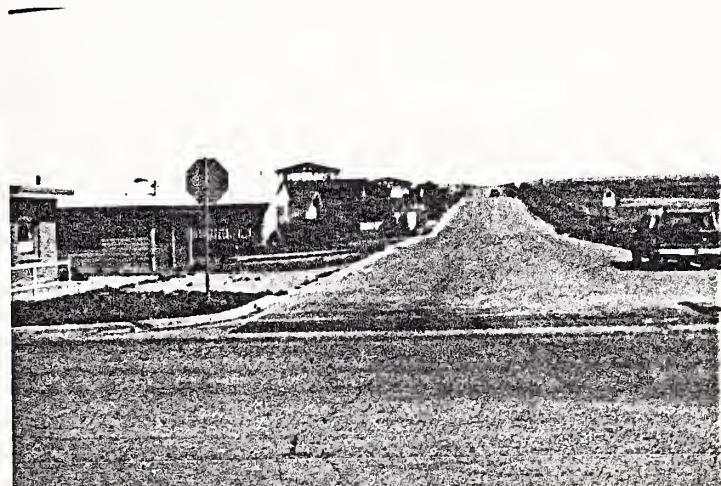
The intersection approach from the north on Sixteenth Avenue is 40 feet wide and slopes toward the intersection at a grade of approximately 1%.
